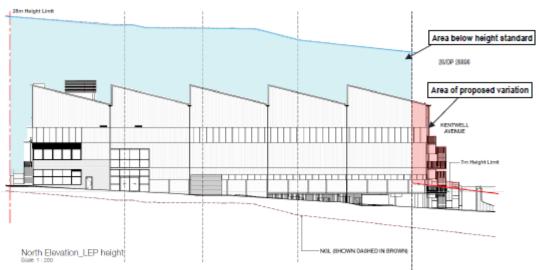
Indicative height plan diagram from the proposed internal road (Maximum building height – northern elevation)
